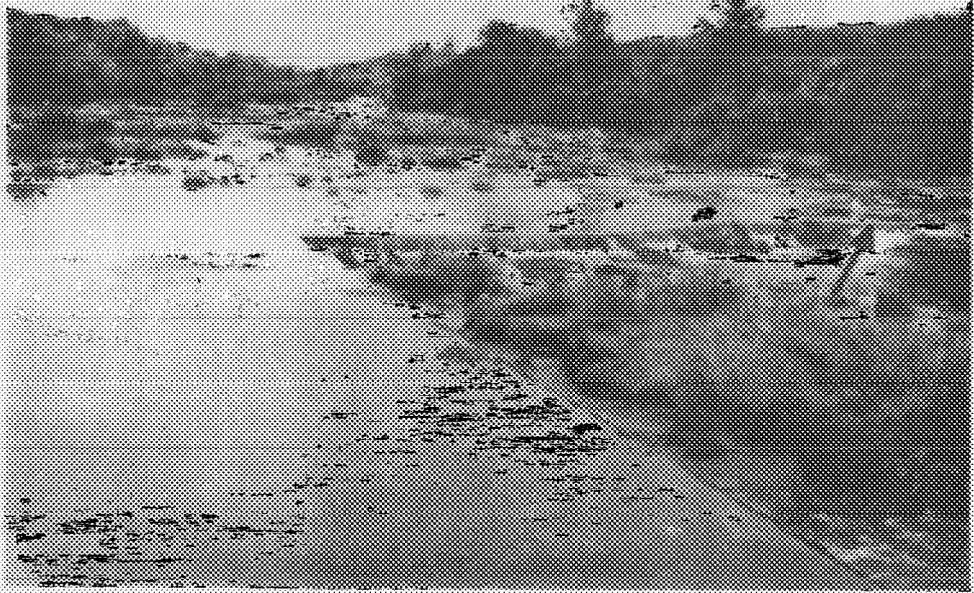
CONSTRUCT STOP LOG STA. 80+65
